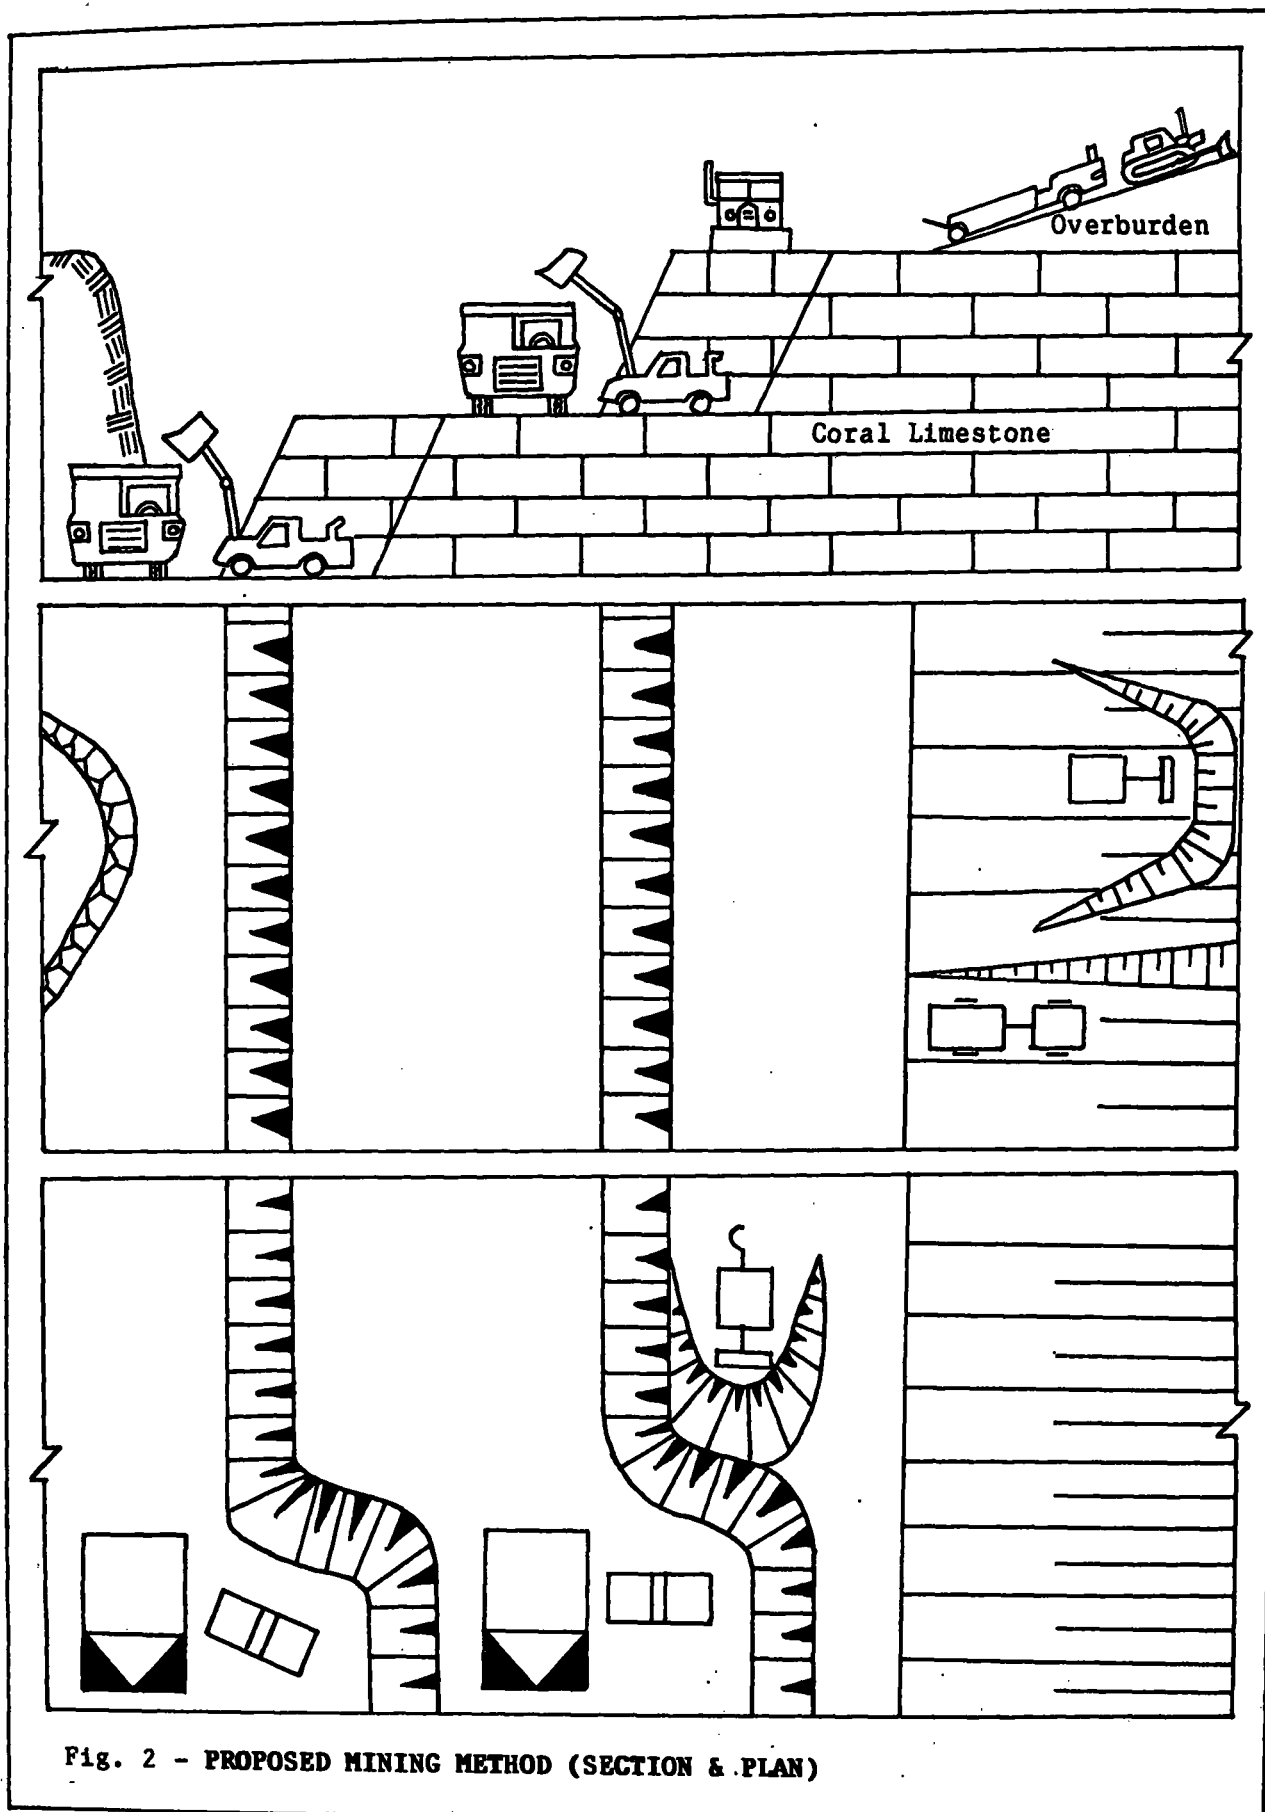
PROPOSED MINING METHOD (SECTION & PLAN)
